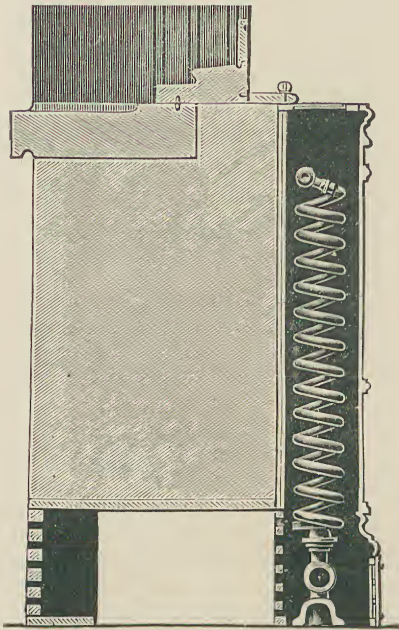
Section showing Coil Radiator in Cast-iron Case, with Air-inlet, &c.
